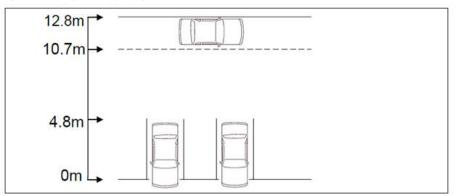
Typical 90 Degree Treatment on a 12.8m wide Road
